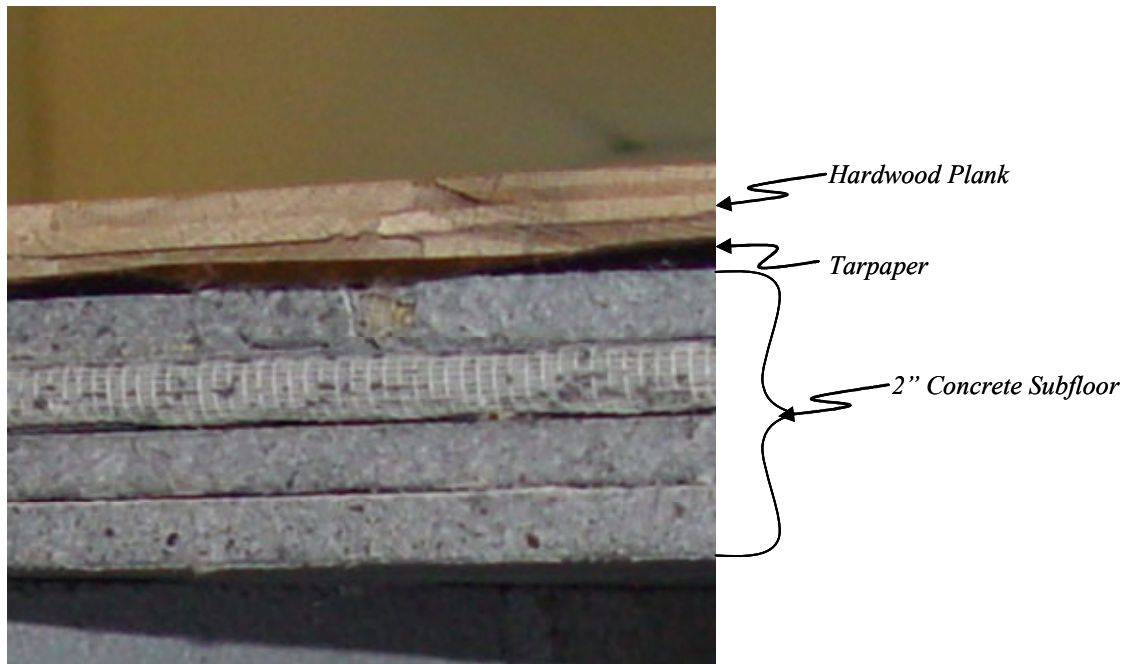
Experimental setup for hardwood flooring on concrete installation.
